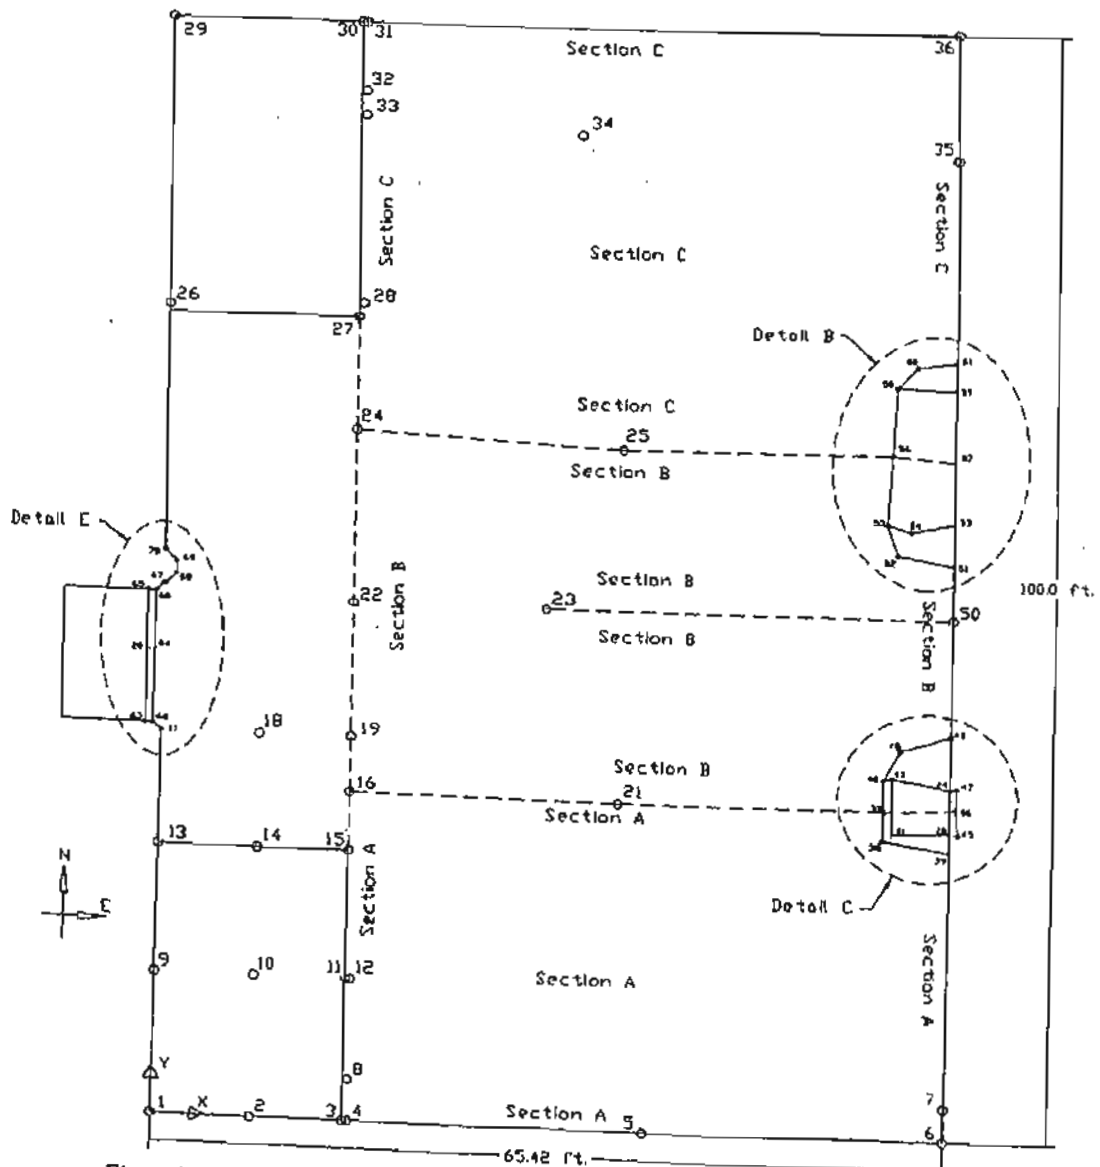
Schematic the shows CSA II, known elevation points, and ramp details
